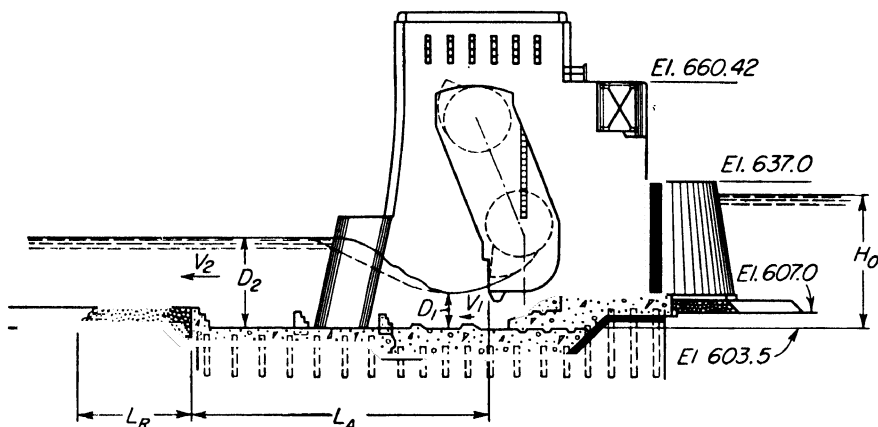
Typical cross section of a roller-gate dam on the upper Mississippi River.
